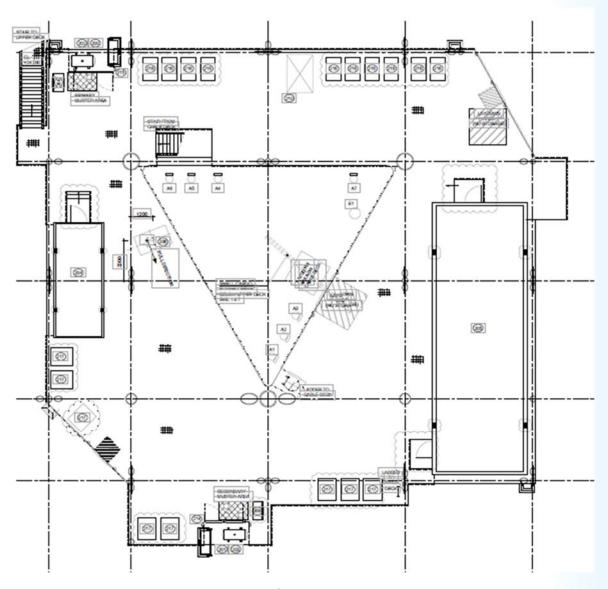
OSP general arrangement – plan view of topside lower deck
